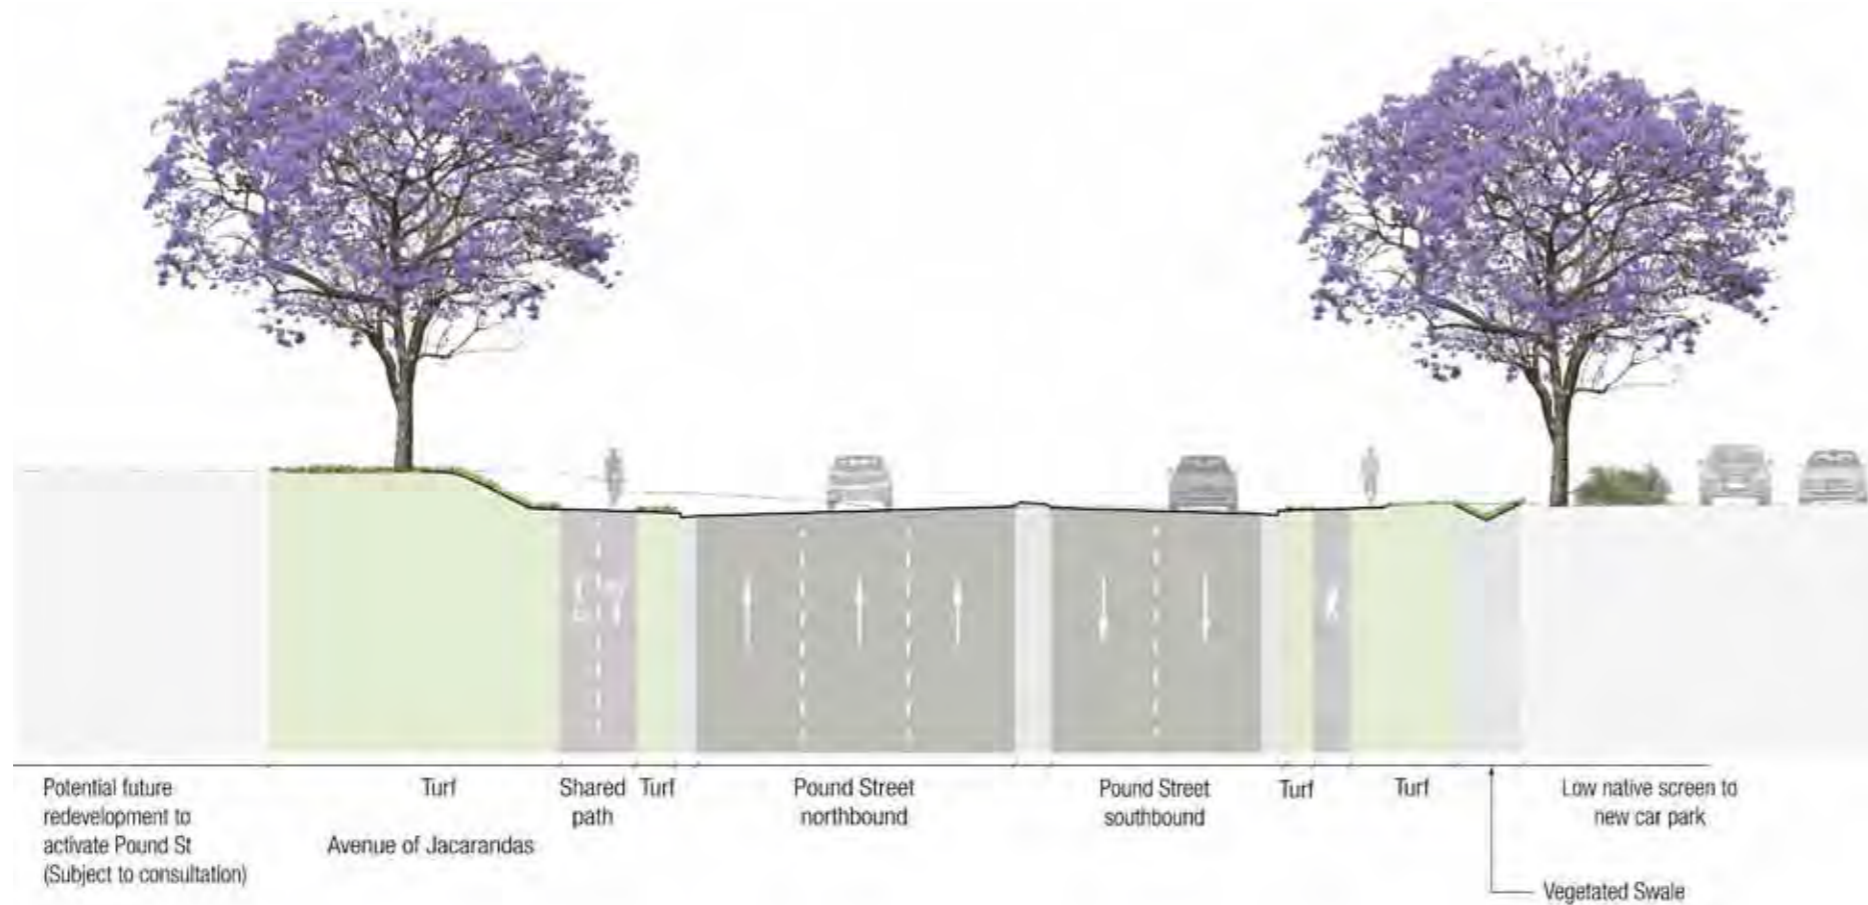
Cross section at Pound Street - Ch 1725 (Scale 1:250)
